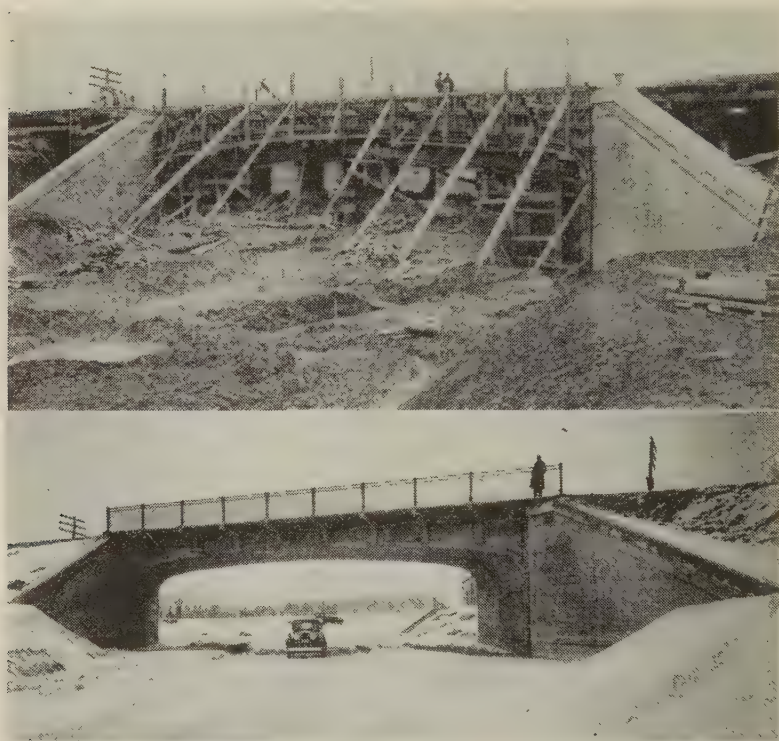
AND 11—VAUDRIEUL SUBWAY
